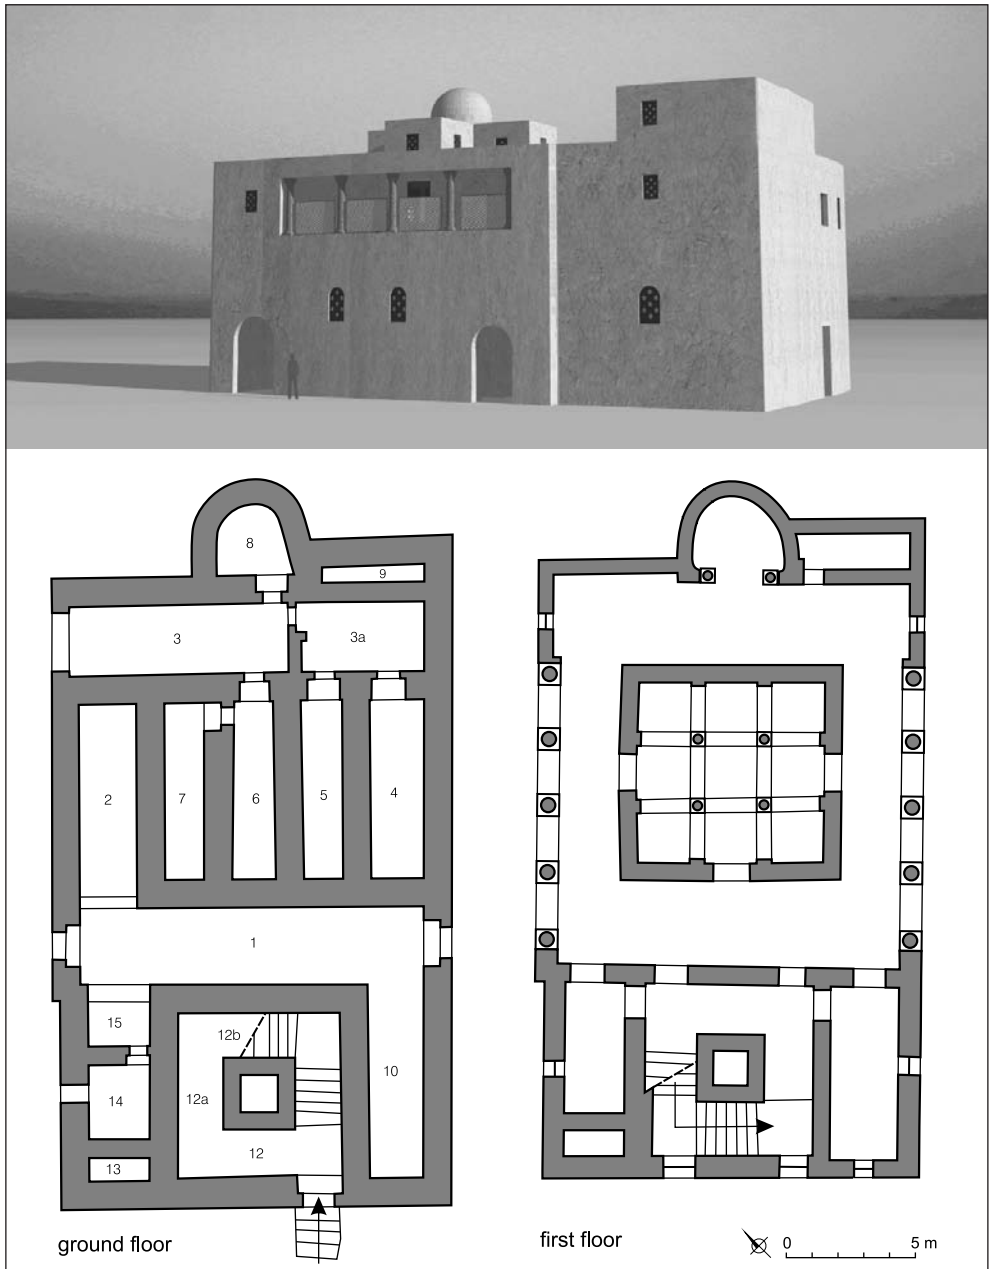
Mosque Building: original plans of the ground and first floors; top, reconstruction of the original appearance of the building, view from the northwest (Reconstruction W. Godlewski, D. Zielińska; drawing W. Godlewski, S. Maślak)
